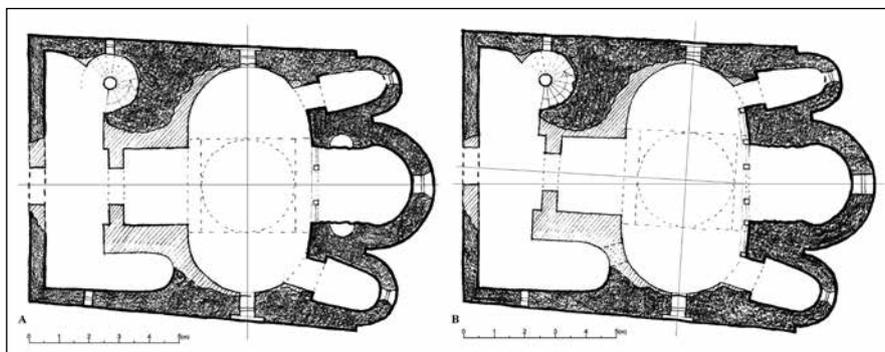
Hypothetic reconstruction of the church's ground plan, two variants (drawings: author)
